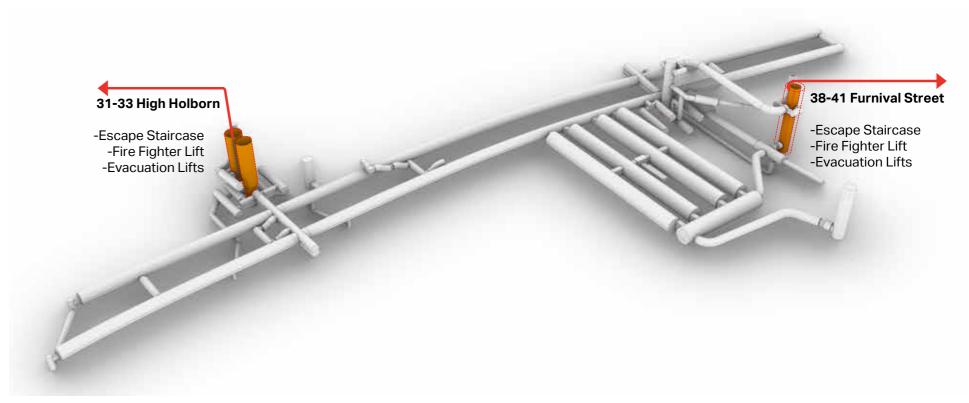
Means of Escape at Fulwood Place and Furnival Street
